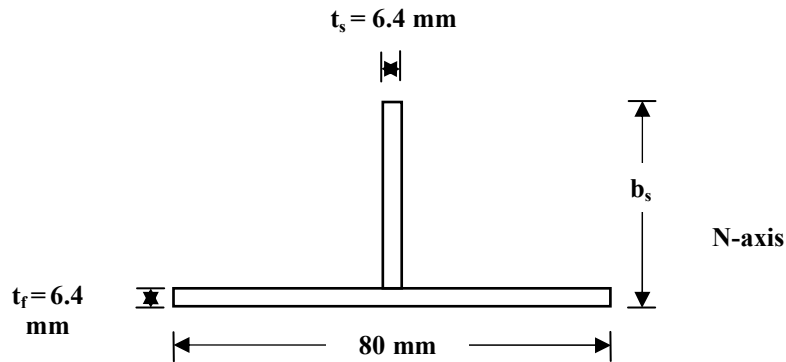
Required cross-section of diagonal stiffeners for specimen B6
